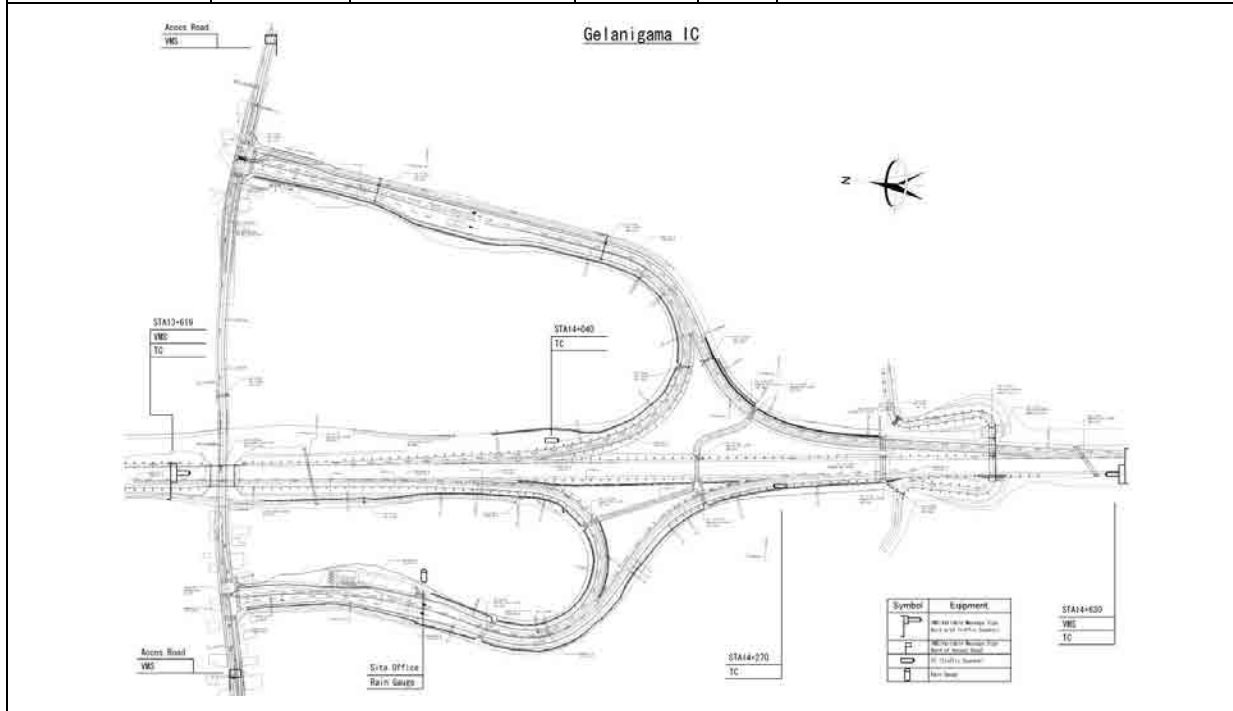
Road side equipment layout plan (Gelanigama IC)
